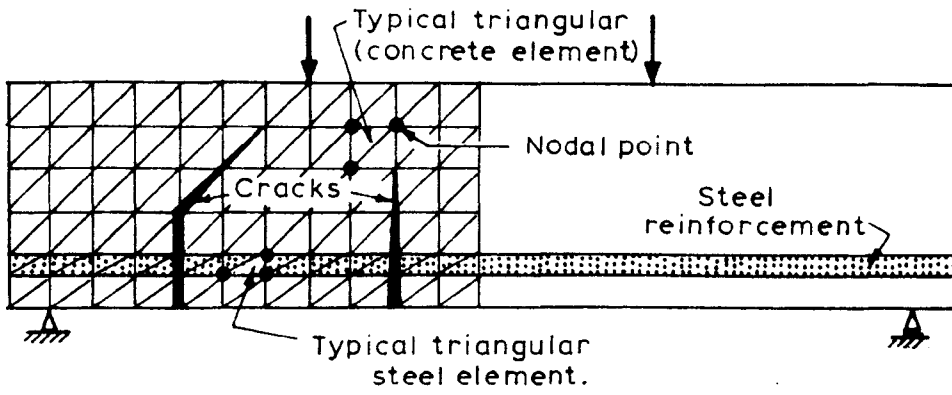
REINFORCED CONCRETE BEAM MODELLED IN [9].
